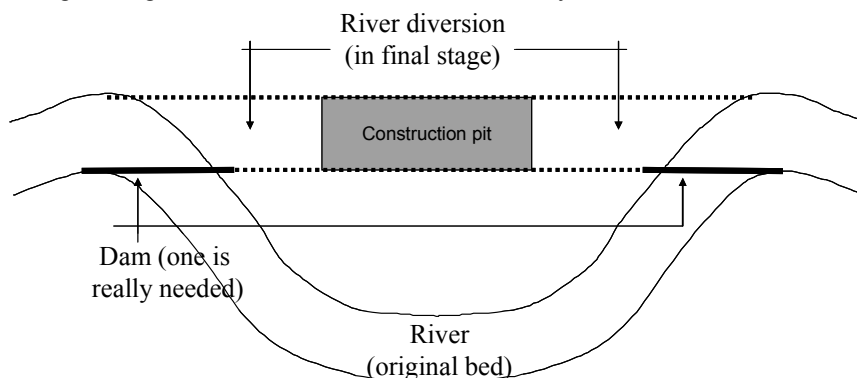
Pit outside the watercourse and (later) diversion to connect the lock
